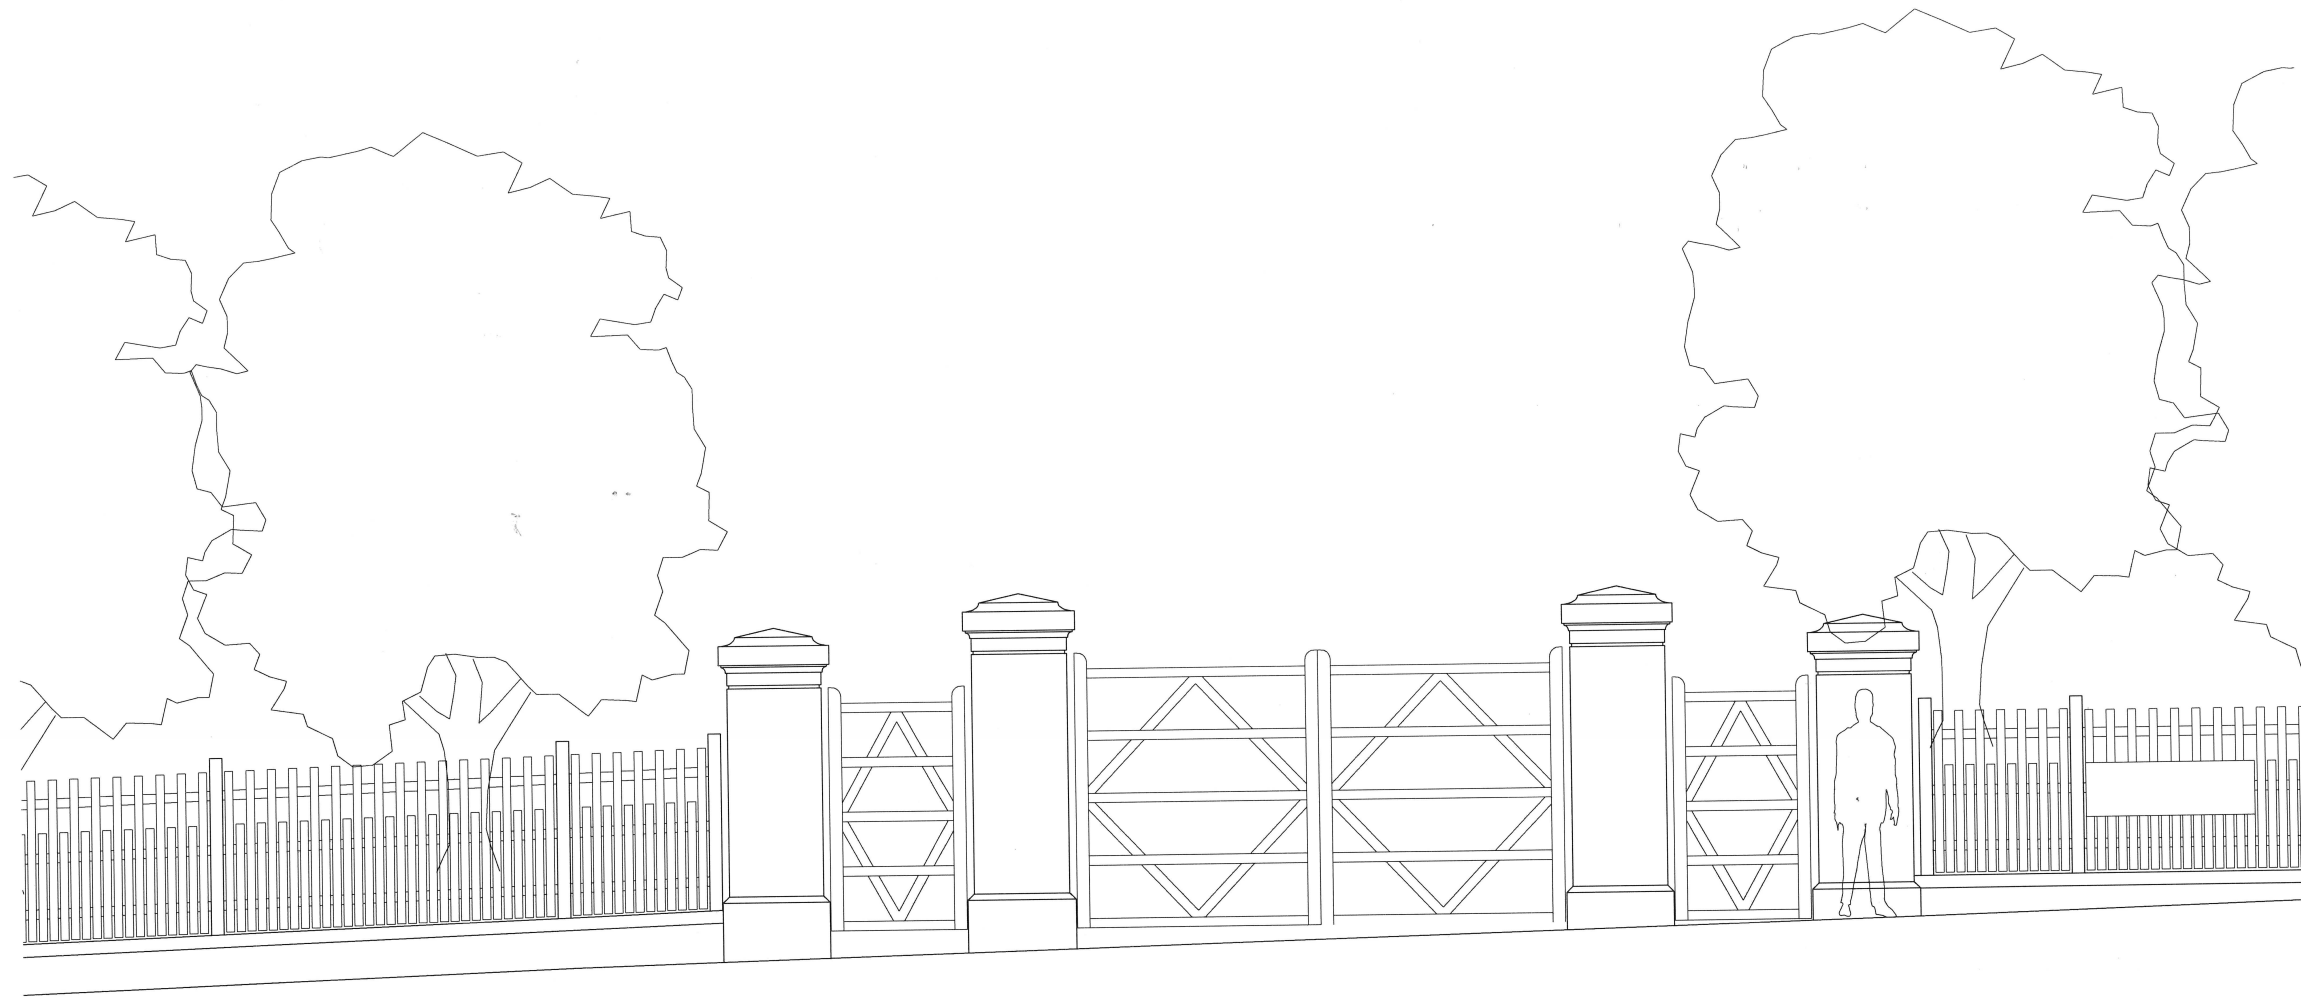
Architects drawing of proposed new gates and fence along Union Street Frontage
